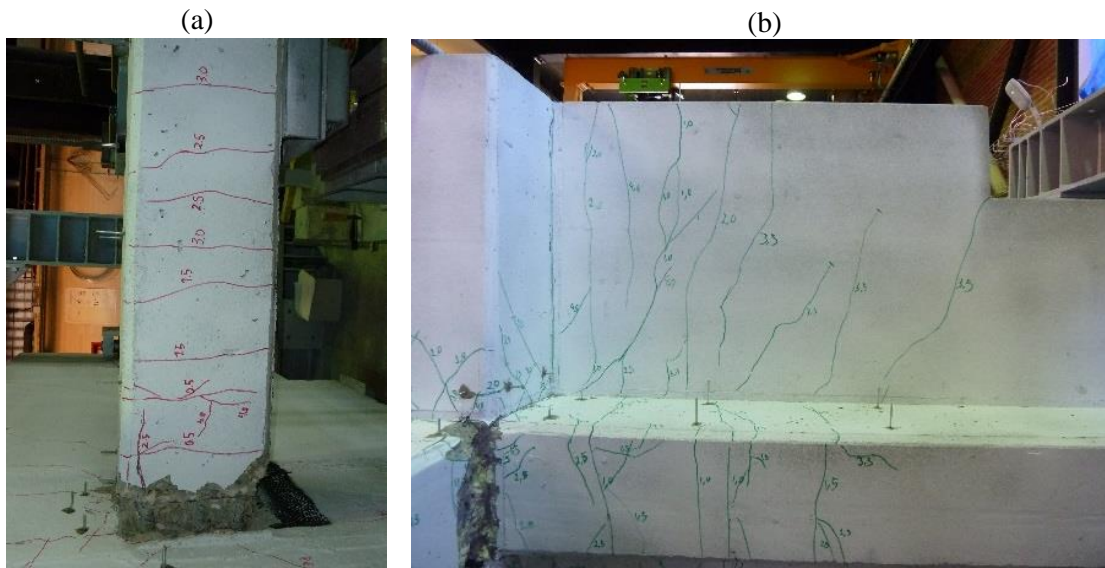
Final damage state in C-EC8; (a) superior column, (b) beam underside.
